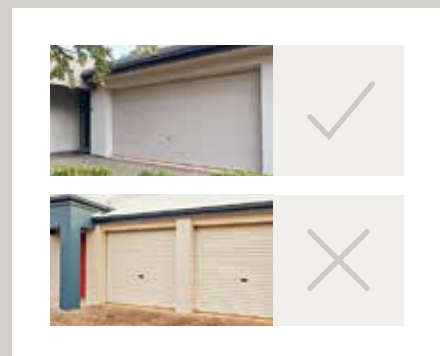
ACCEPTED PANEL-LIFT DOOR. STANDARD ROLLER DOORS NOT PERMITTED
